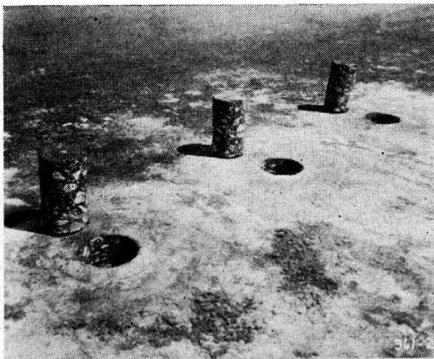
Cores were cut from 9-in. asphaltic concrete pavement using a chilled shot core drill.
